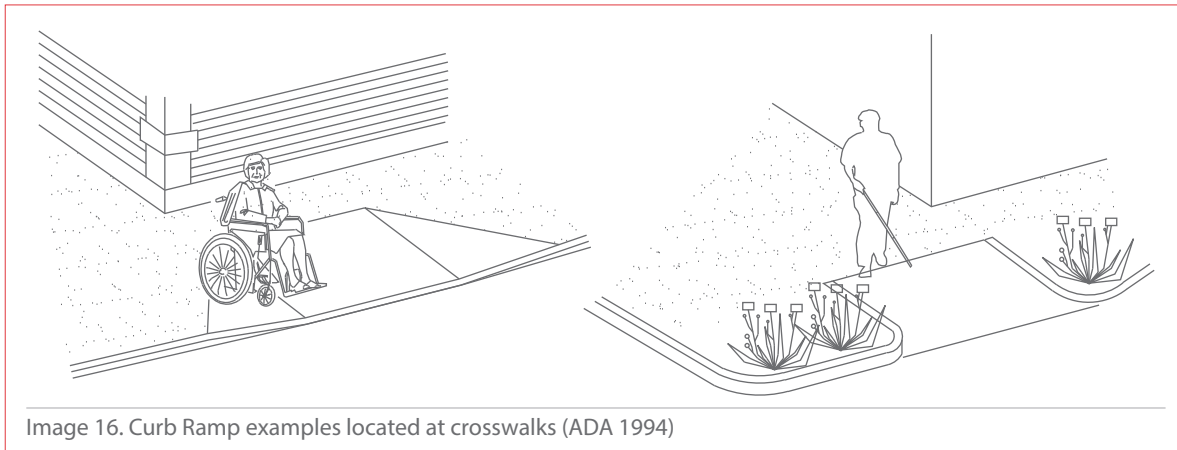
Curb Ramp examples located at crosswalks (ADA 1994)
